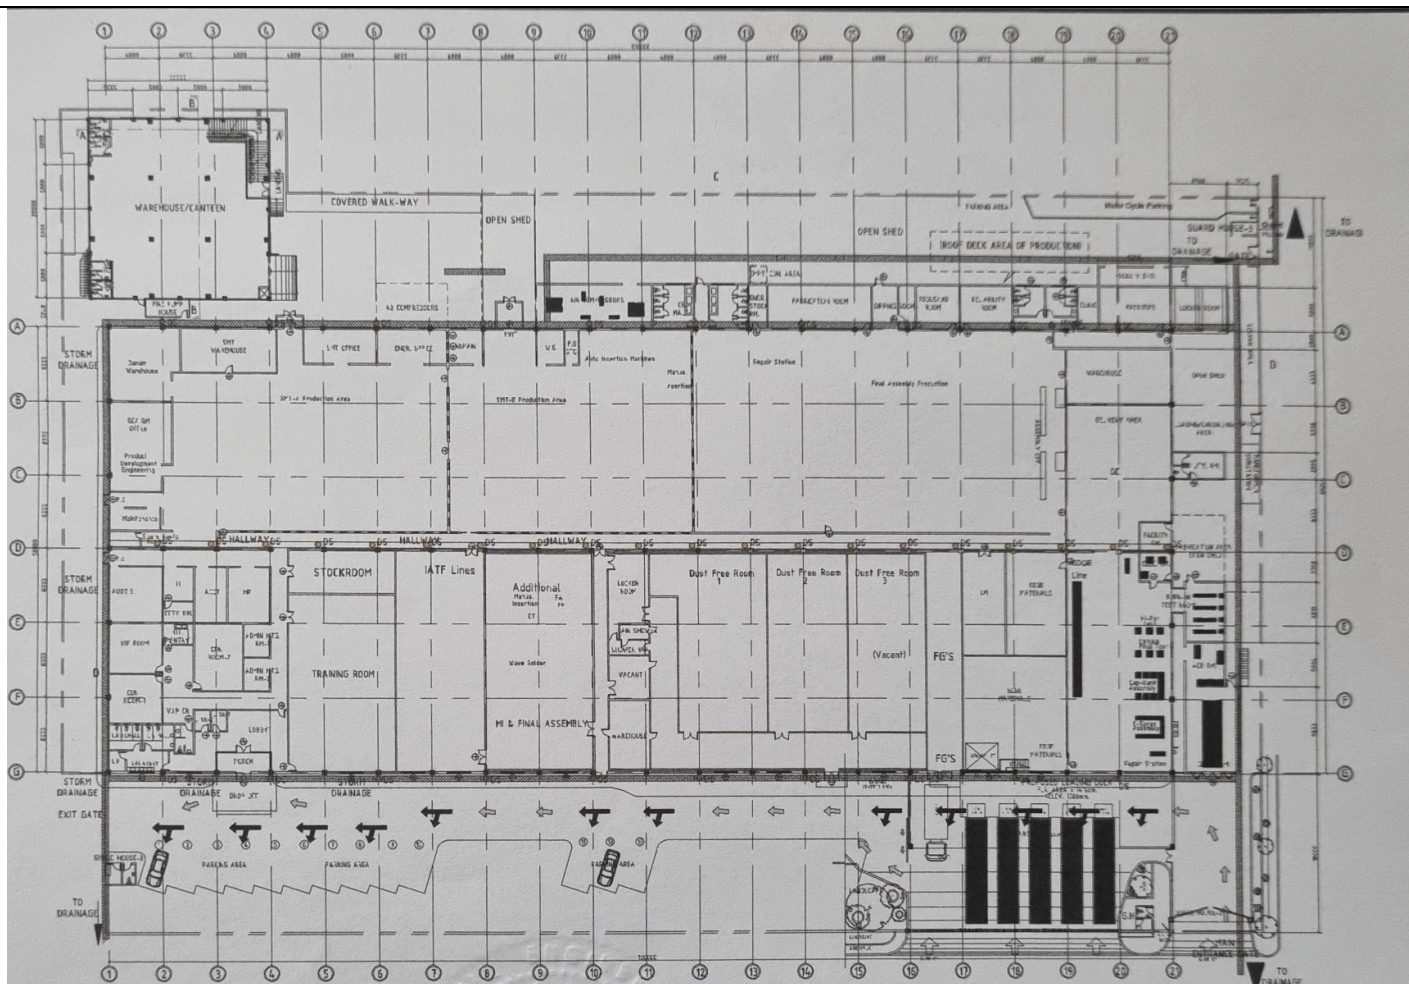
Existing Stormwater Drainage Layout of Plant 2
